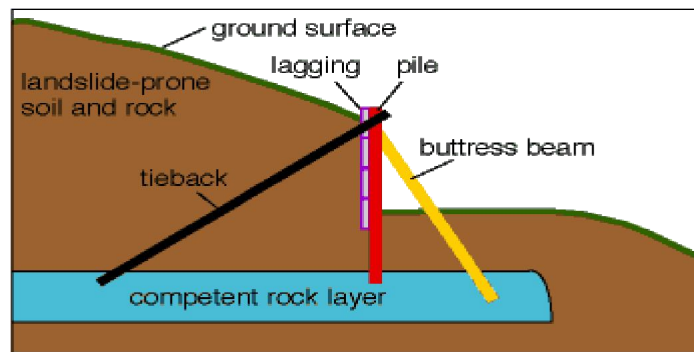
Diagram of a retaining wall with tiebacks and buttress beams.
